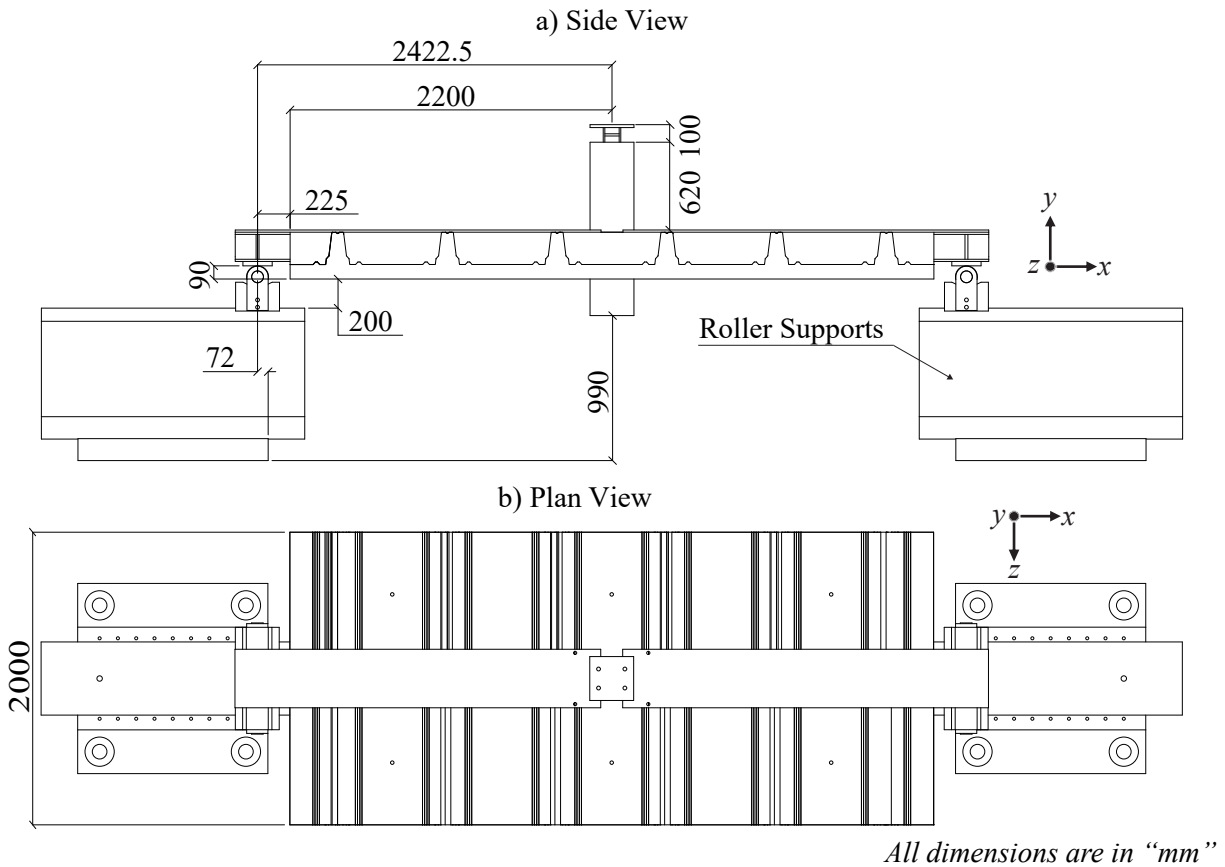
Overall dimensions of the test set-up for GJSFB test campaign.
